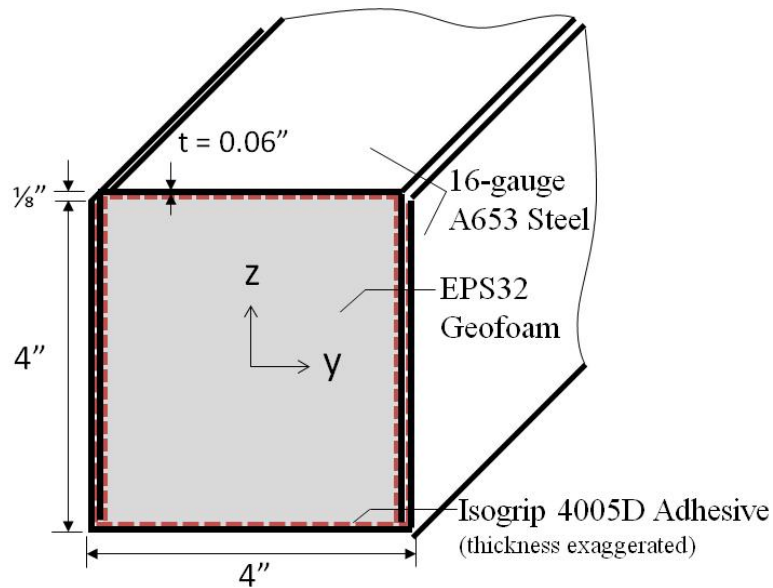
Illustration of Foam-Filled Steel Column Cross-Section
